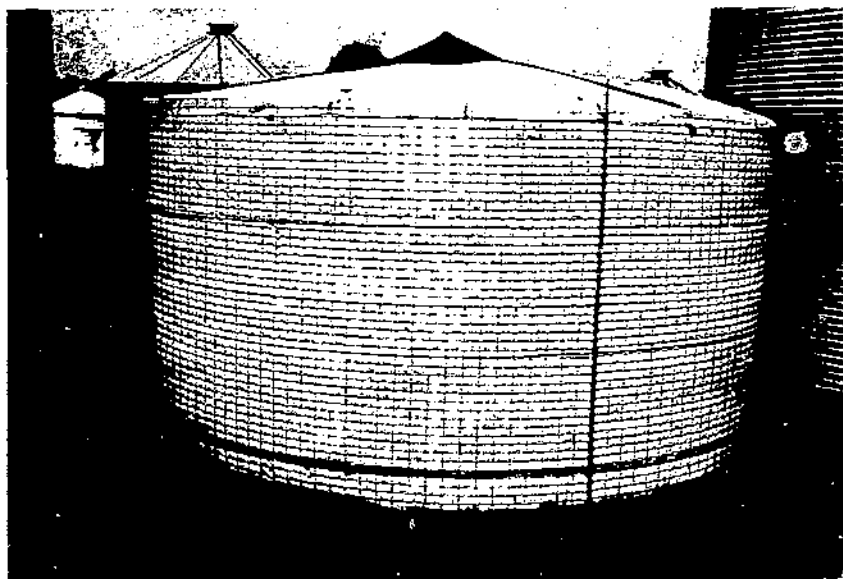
Temporary 1,400-bushel bin of white asbestos-surfaced roll roofing and welded-wire fencing with roll-roofing flooring, Hutchinson, 1915.
